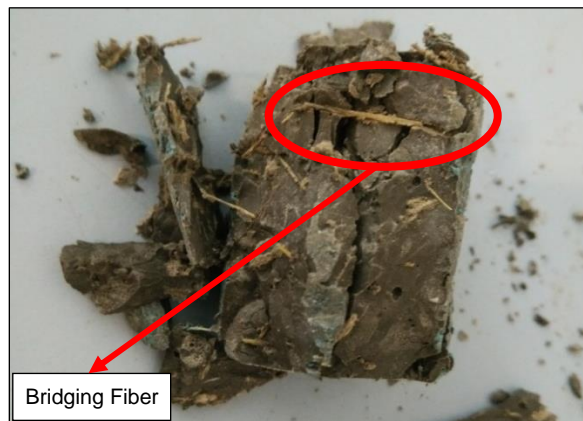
Fractured Specimen Shows Bagasse Fibre Acting as Bridging Agent
